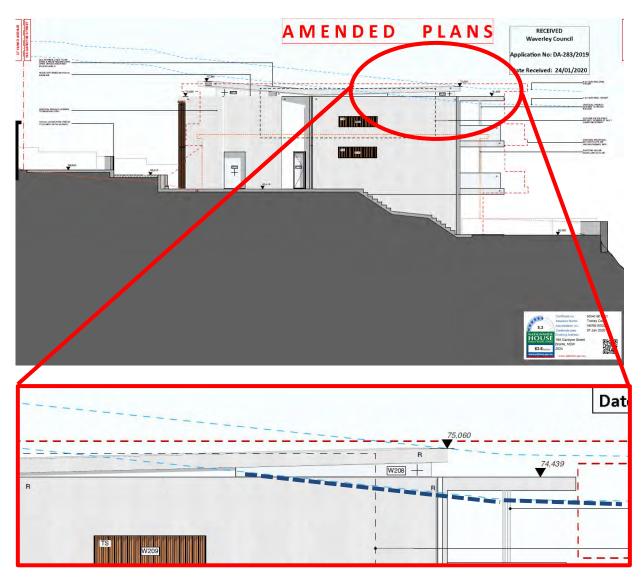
Wall height exceedance to eastern elevation (dashed in dark blue).
